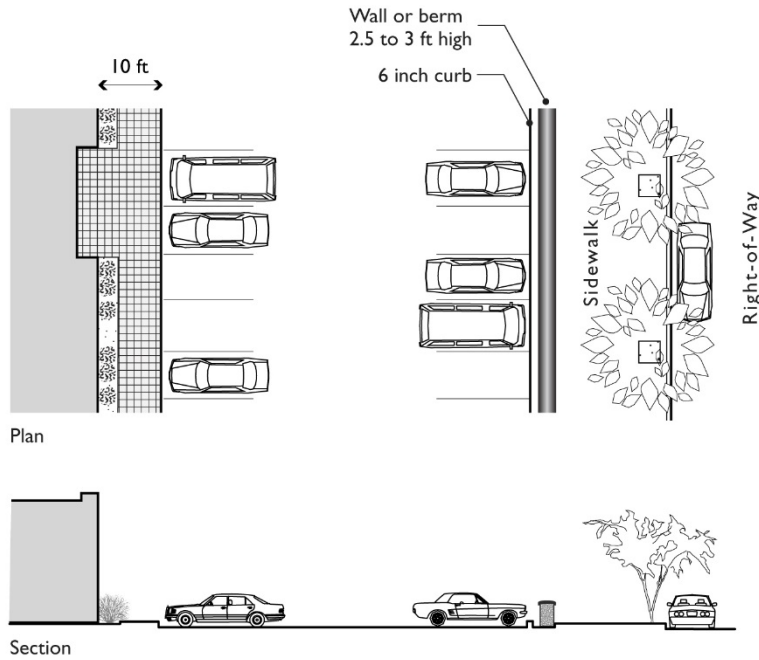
E: SCREENING AND SEPARATION OF PARKING AREA
